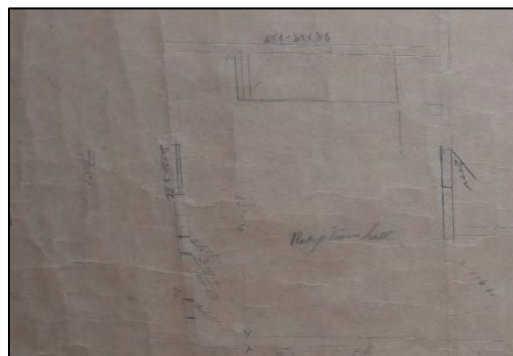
Portion of original floorplan depicting entry and sidelight arrangement between porch and reception hall, at left, and stairway at top
